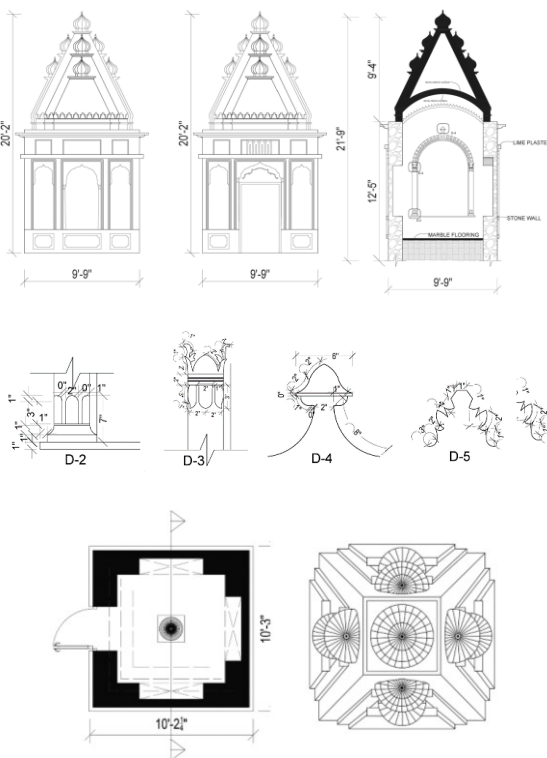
Ram Kund temple. Above: Temple elevations and section. Middle: Temple details. Below: Temple plans. (Source: Ramsha Nazir Malik)
